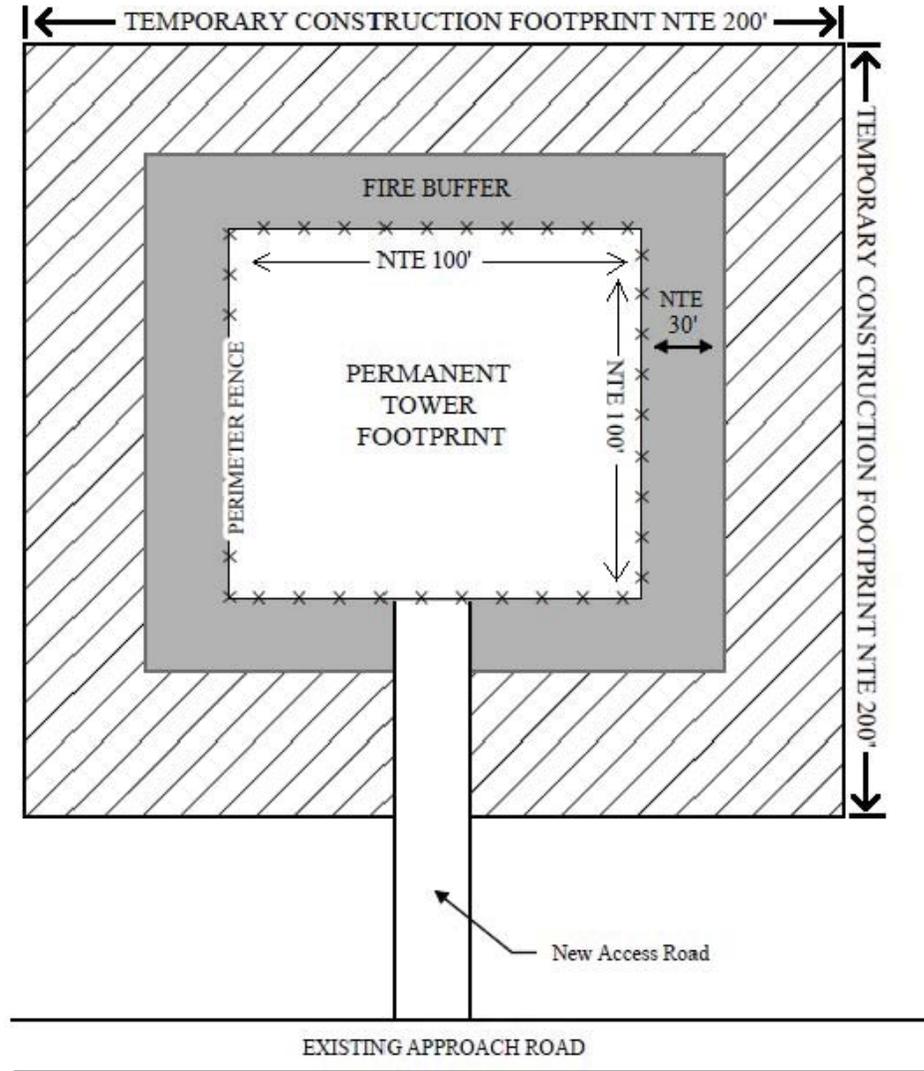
Typical IFT Site Portfolio. Actual tower structure and configuration may vary.
